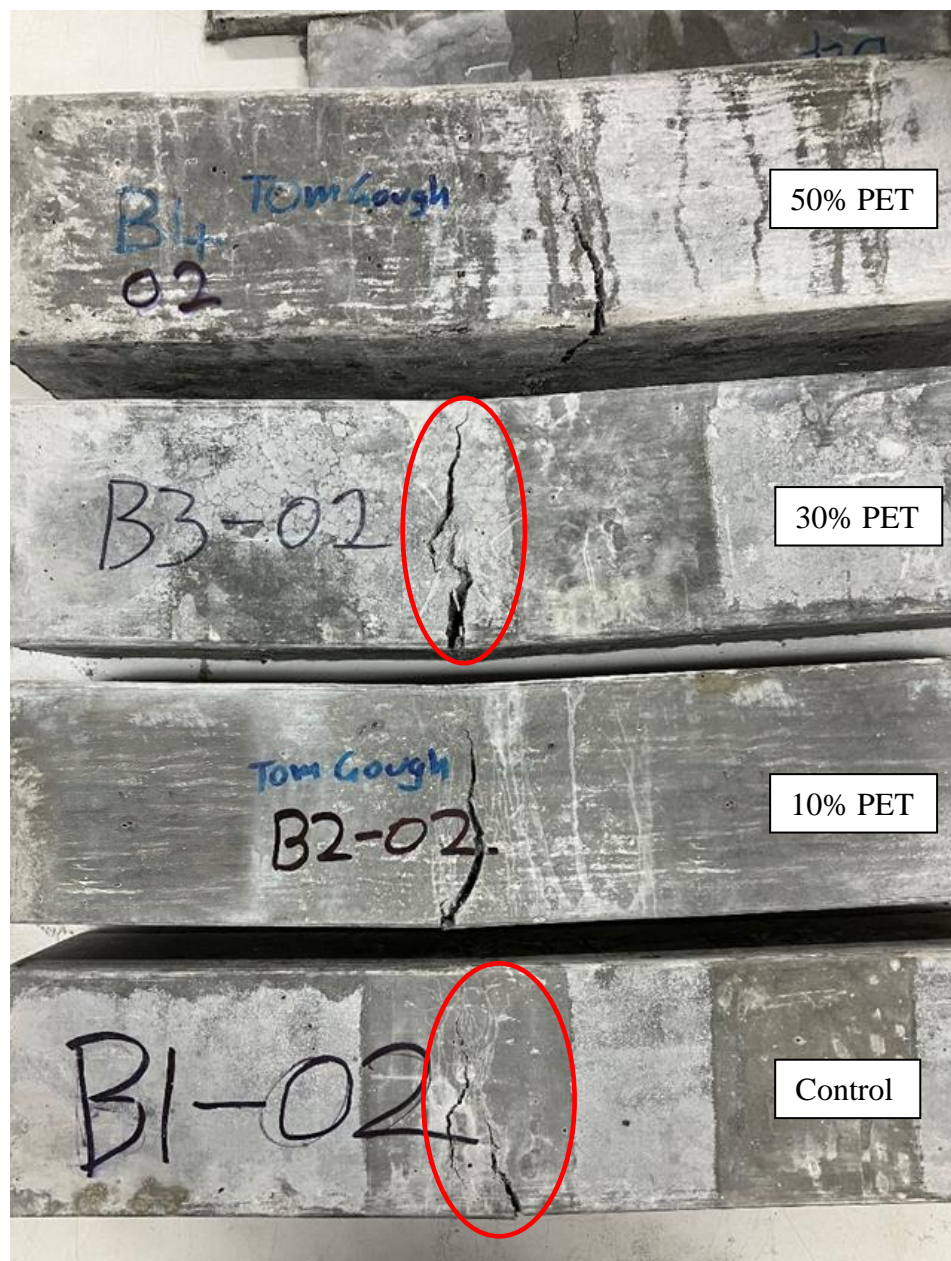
Residual beam failure patterns with fibre bridging highlighted
